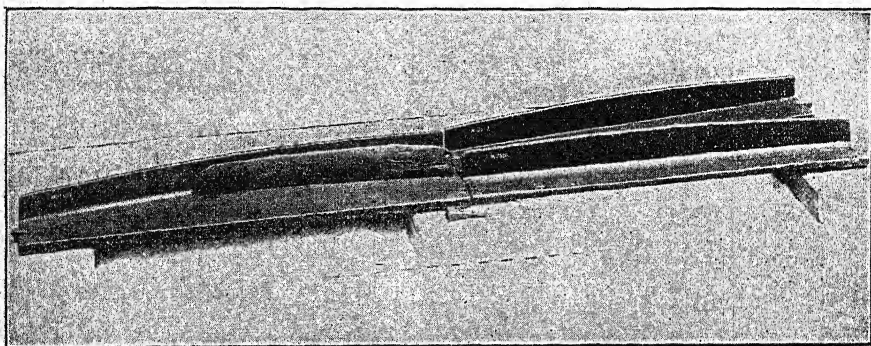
PLATE-RAIL AND STONE SLEEPER, SURREY IRON RAILWAY, 1804.
